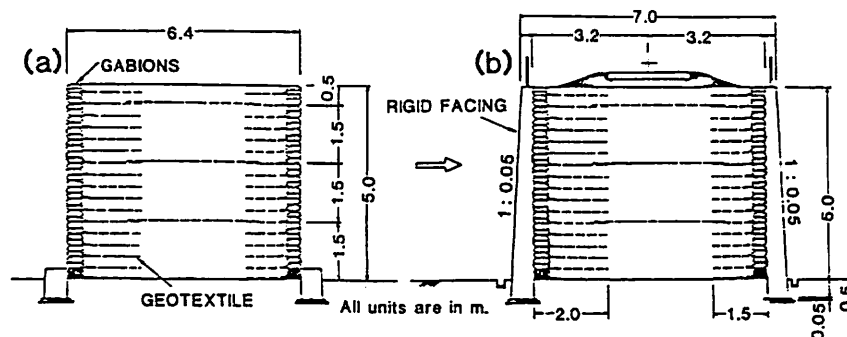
Stage construction method used for JR No.1 embankment (sand)
